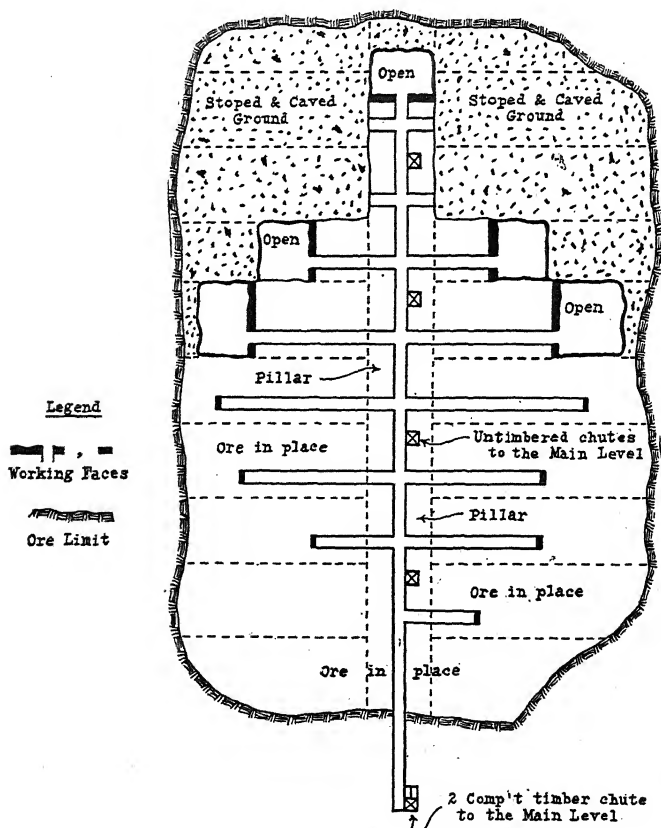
PANEL SLICING. PLAN OF WORKING FACES.
